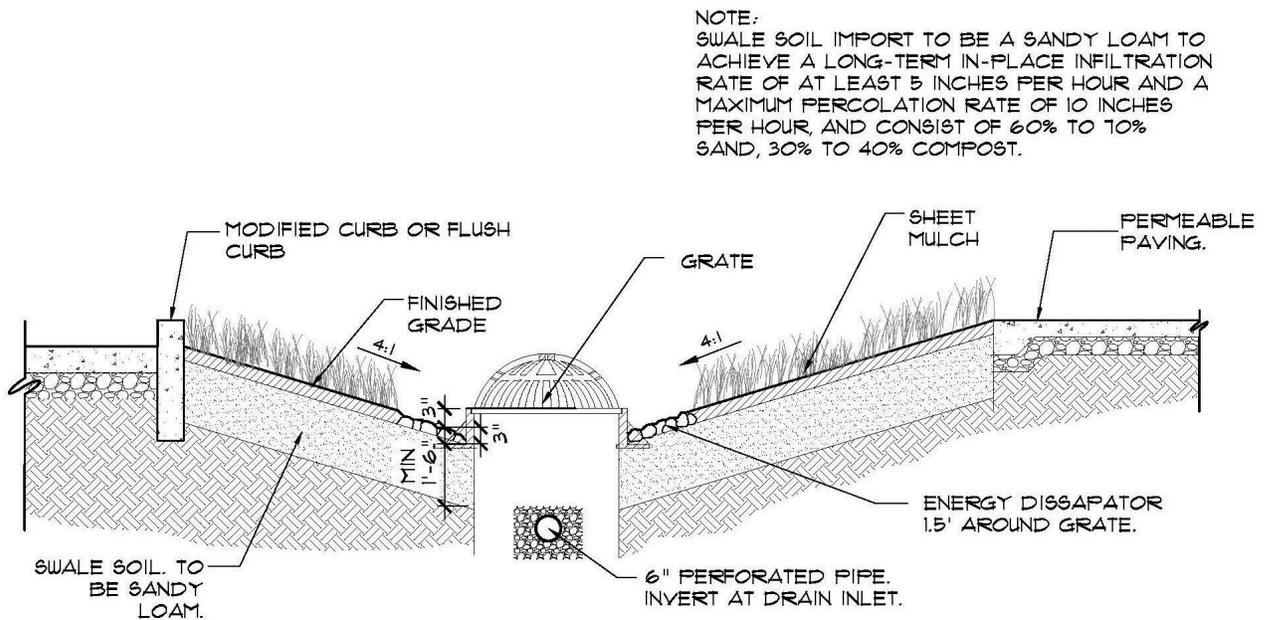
ENGINEERED SWALE TYPICAL SECTION
